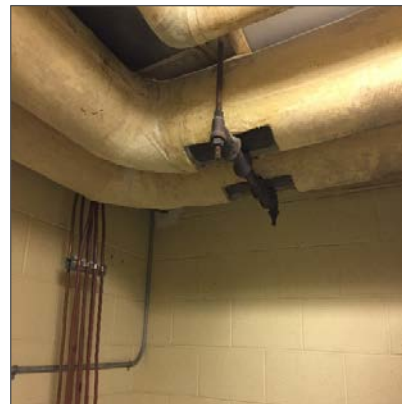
Asbestos-containing parging cement unjacketed at pipe hangers, fair condition, Electrical Room at File Storage, East Basement of Middle Wing.
